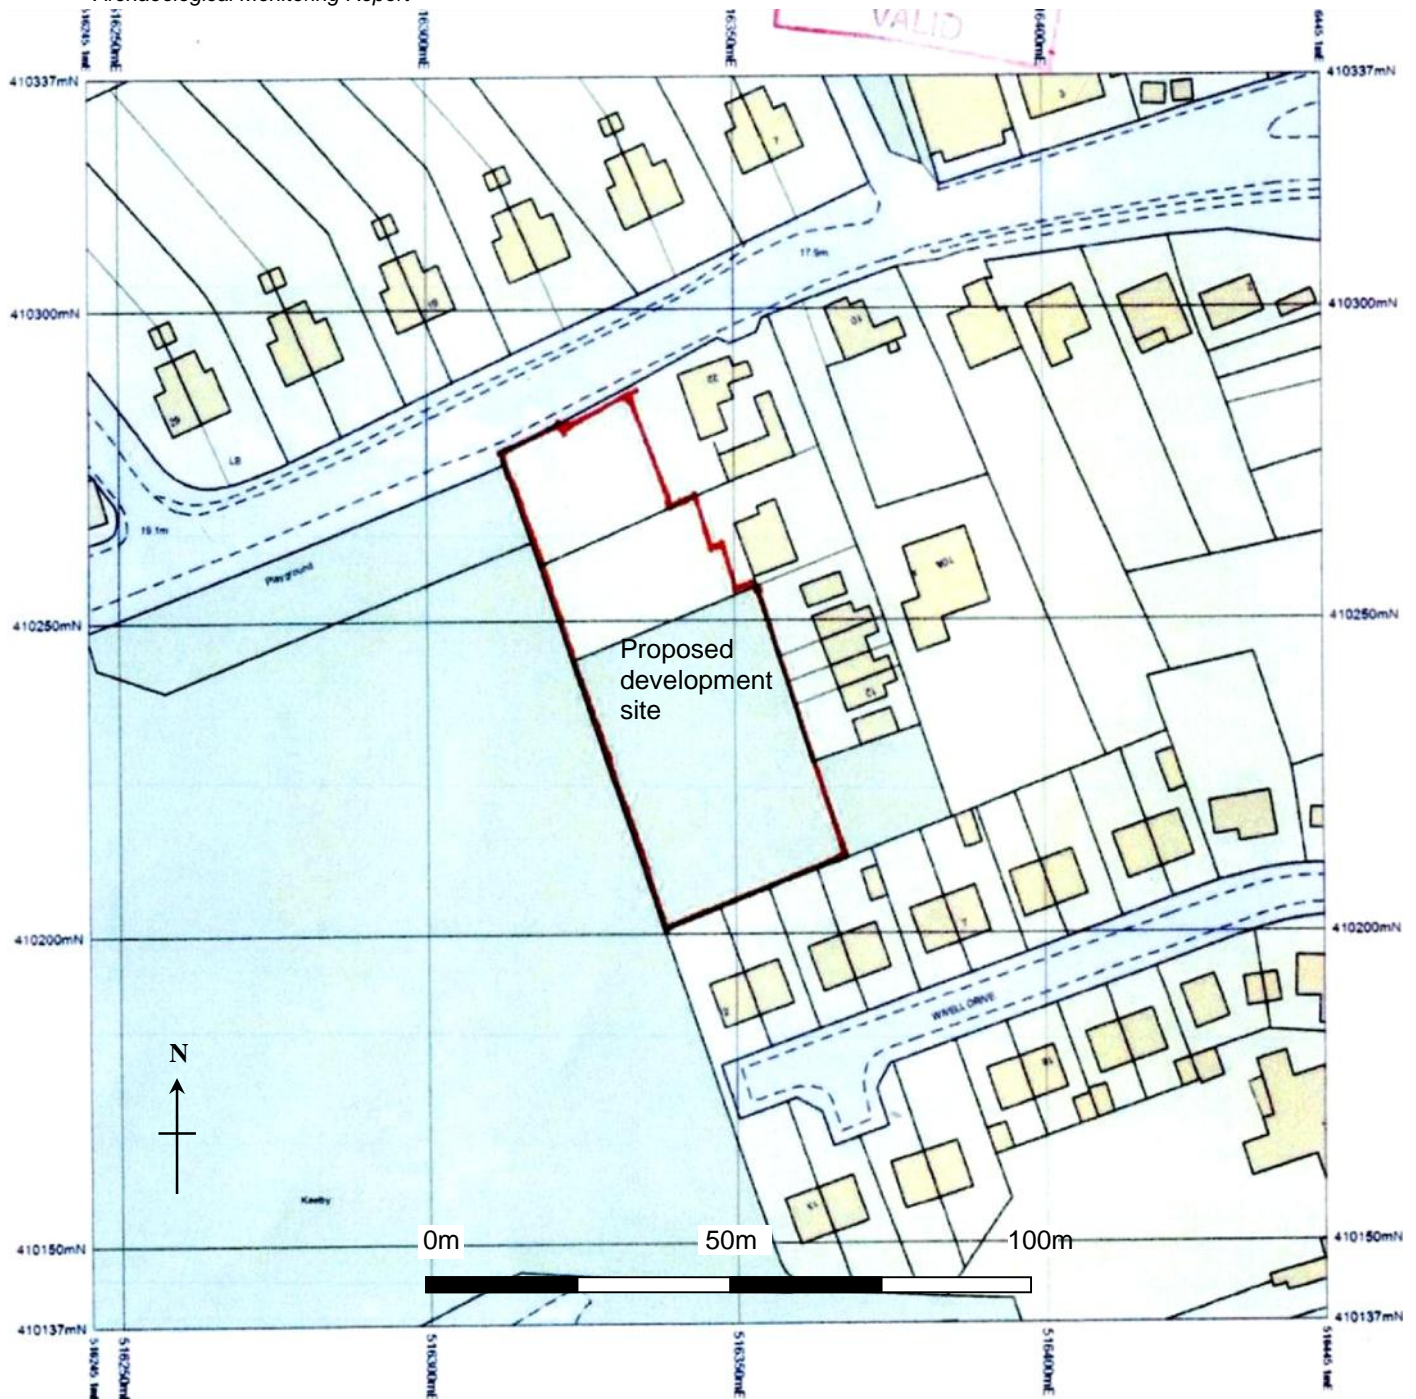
Location plan of the site at scale 1:1250. Plan supplied by client.
